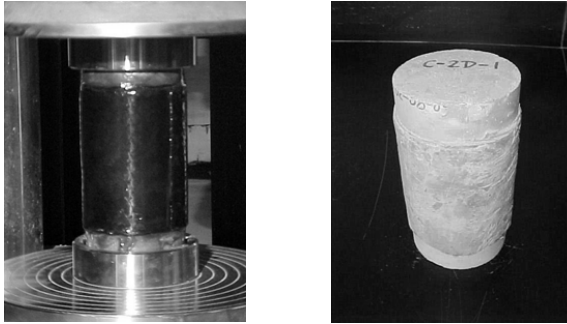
Confinement of concrete cylinders, to the left epoxy bonded CFRP and to the right CFRC wrapped specimen, courtesy of H.C. Wu.
